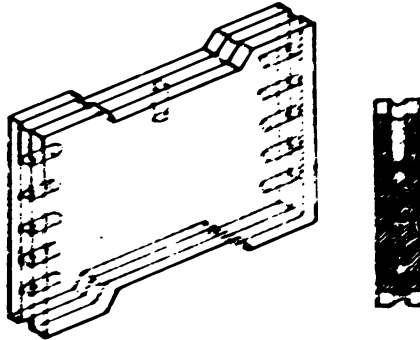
Gypsum stuck upon lath in building walls where no stricks are used.
